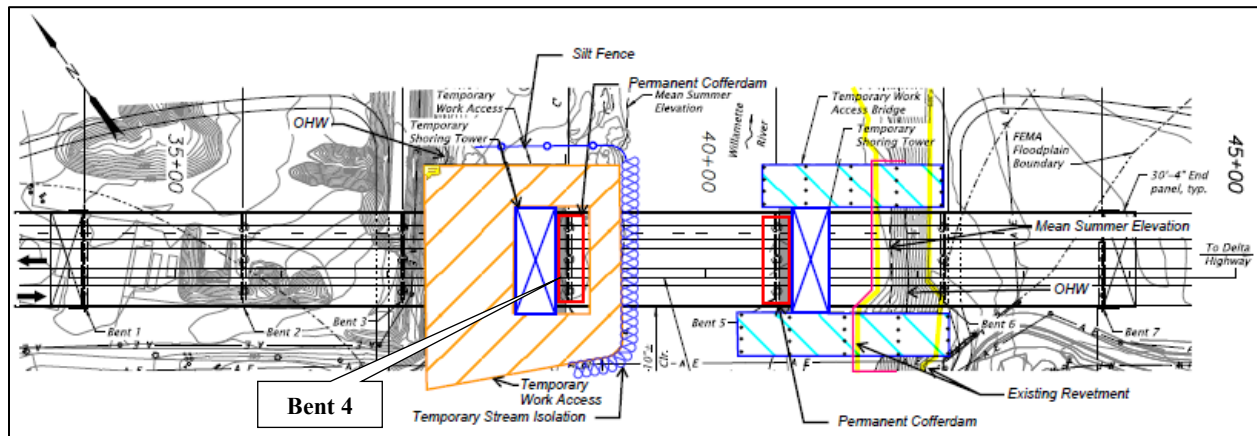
New Willamette River Arterial Bridge plan view showing the location of Bent 4 in the gravel bar.
